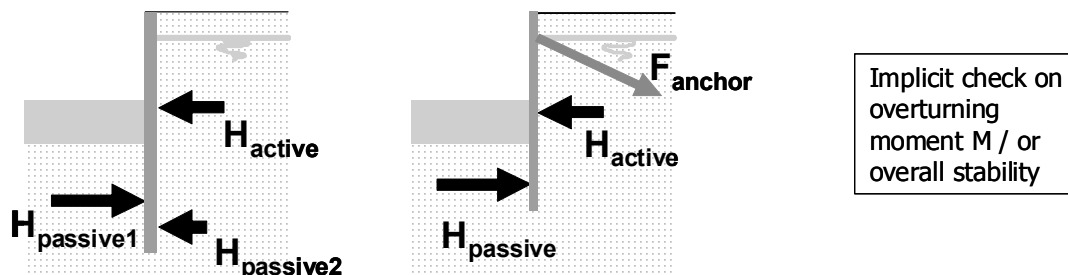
Wall structures; cantilever wall (left), anchored wall (right)
